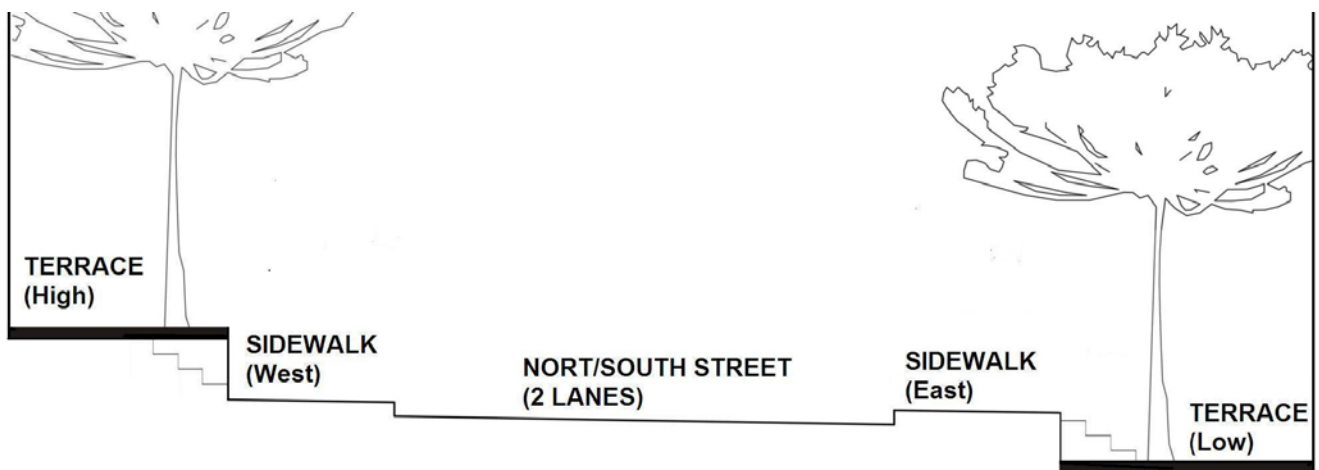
Typical section of the street, with high and low terraces, steps, sidewalks and car lanes.
